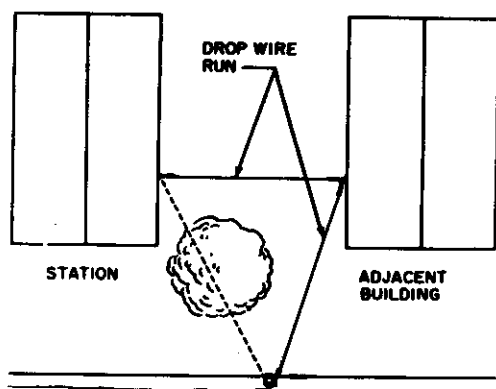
Avoiding Tree Interference, Run to Adjoining Building
